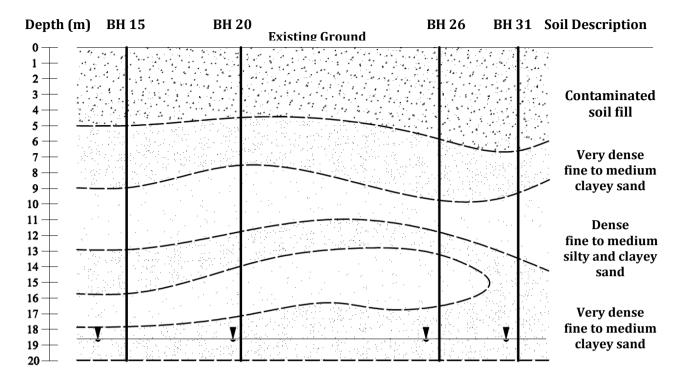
Soil conditions at Al-Jahra site (Jeragh 2009)
